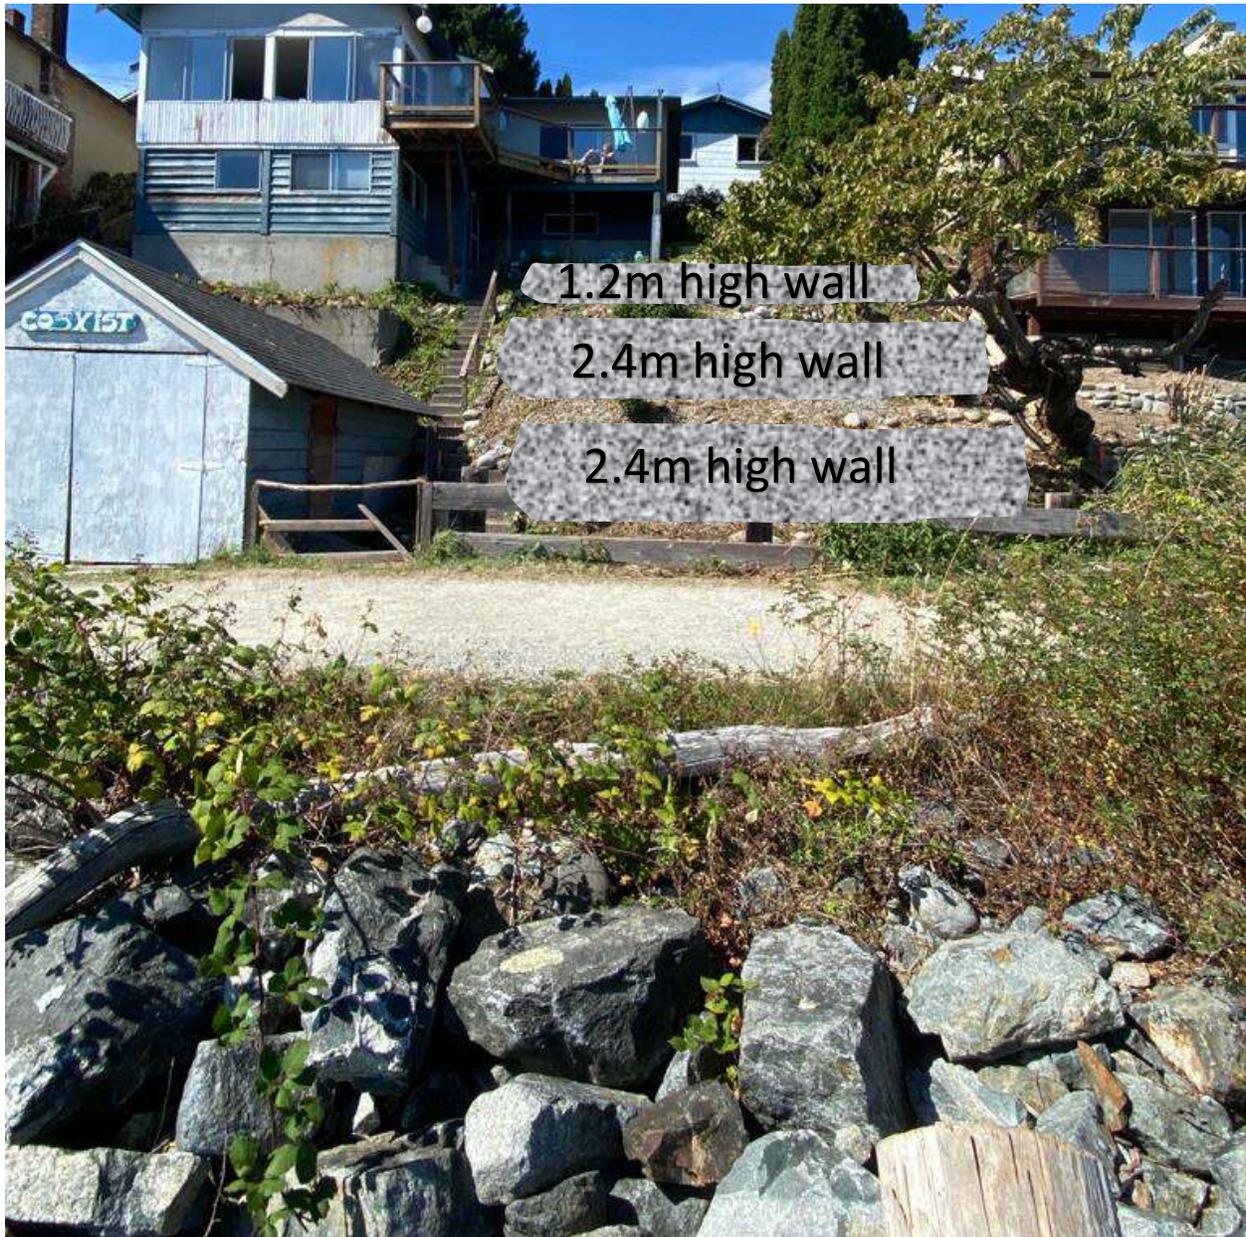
Rear yard slope and proposed retaining walls (looking west from marine shoreline)
